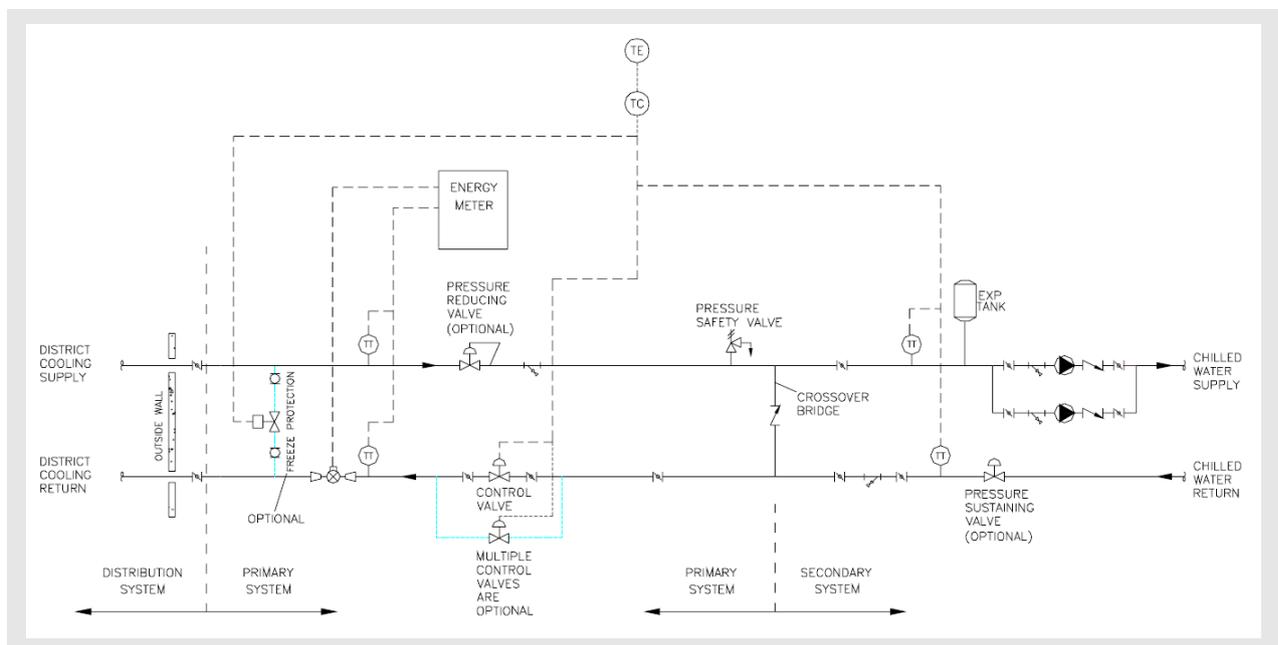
Direct connection of building installation to district cooling system [Skagestad & Mildenstein 2002] [4]
